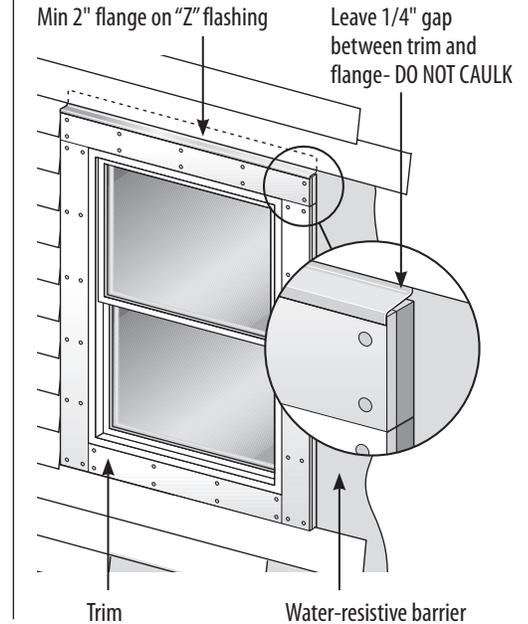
"Z" FLASHING OF HORIZONTAL JOINTS
